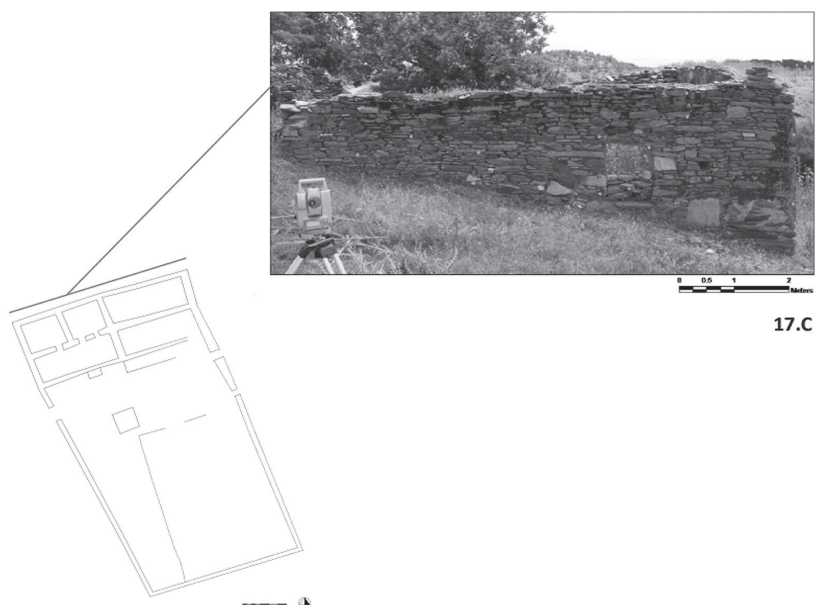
Plan and rectified photograph of wall facade of structure 17 documented in Eski Haciveliler in 2011, an example of the type of documentation undertaken.
